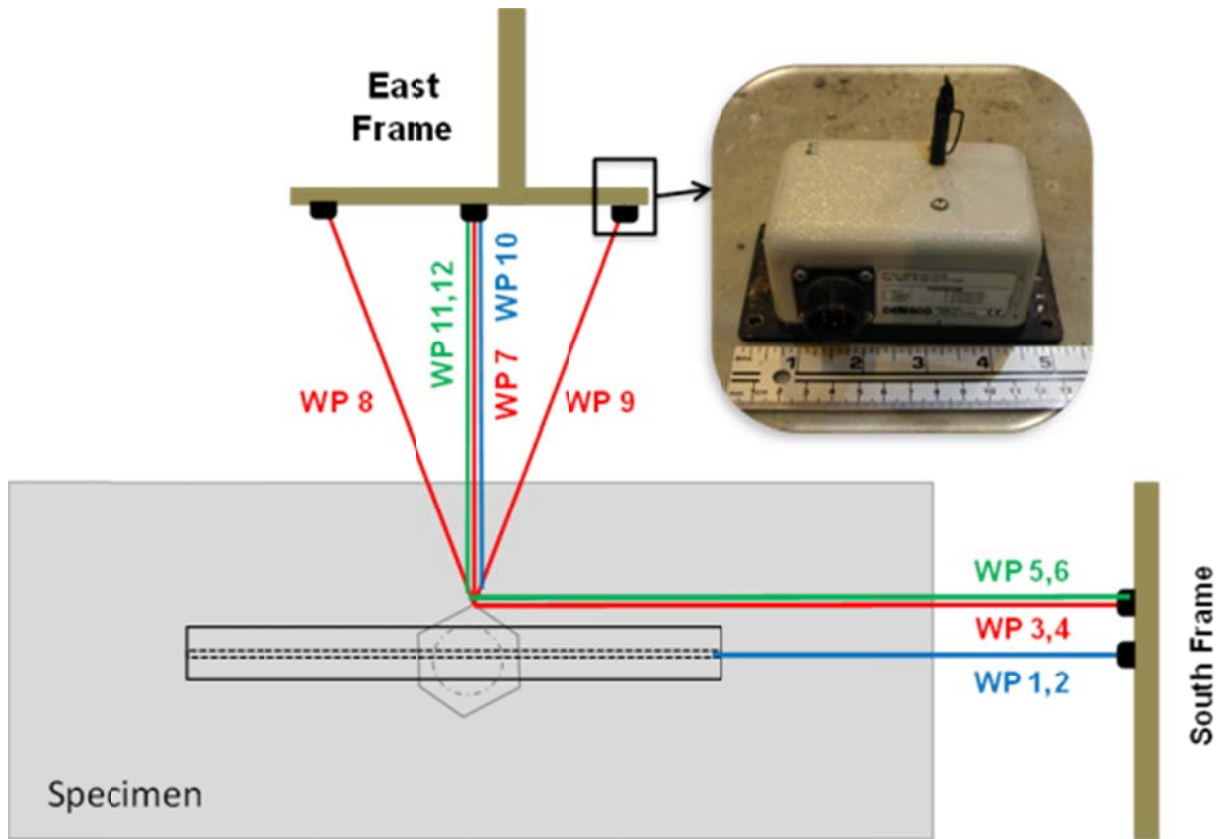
Layout of the wirepots in plan view (East and South sides are identified)
